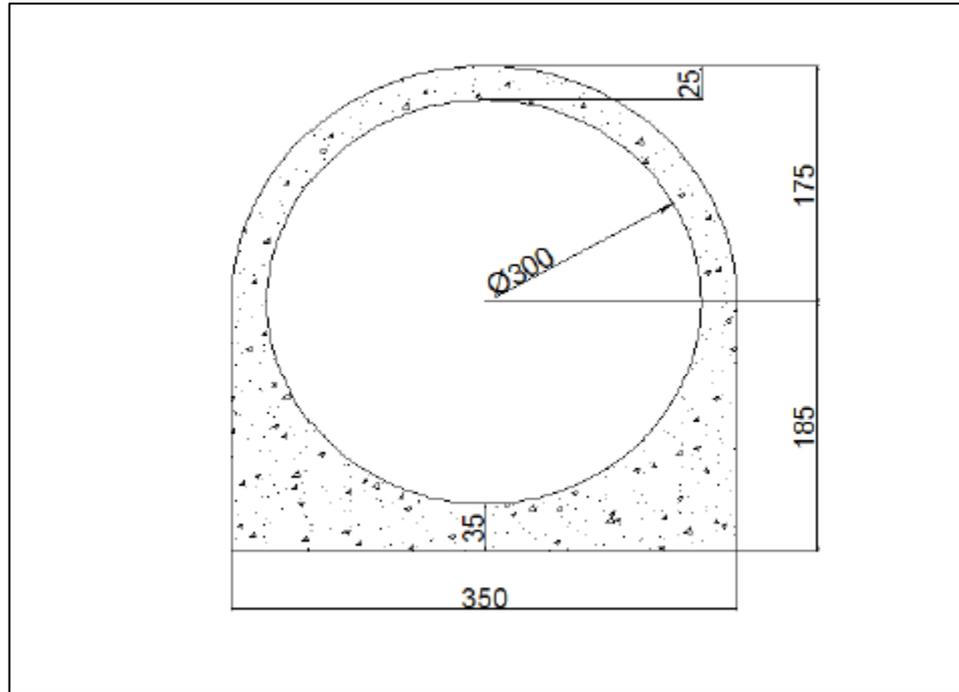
Tunnel Cross-Section (All dimensions are in cm) (Hidromark, 2009)
